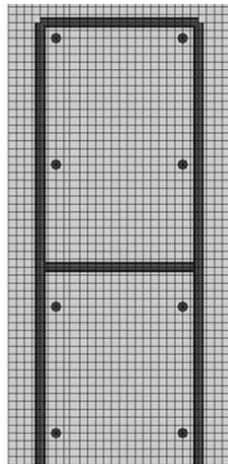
Cross-sectional view of the concrete parapet with horizontal and vertical steel reinforcement.
